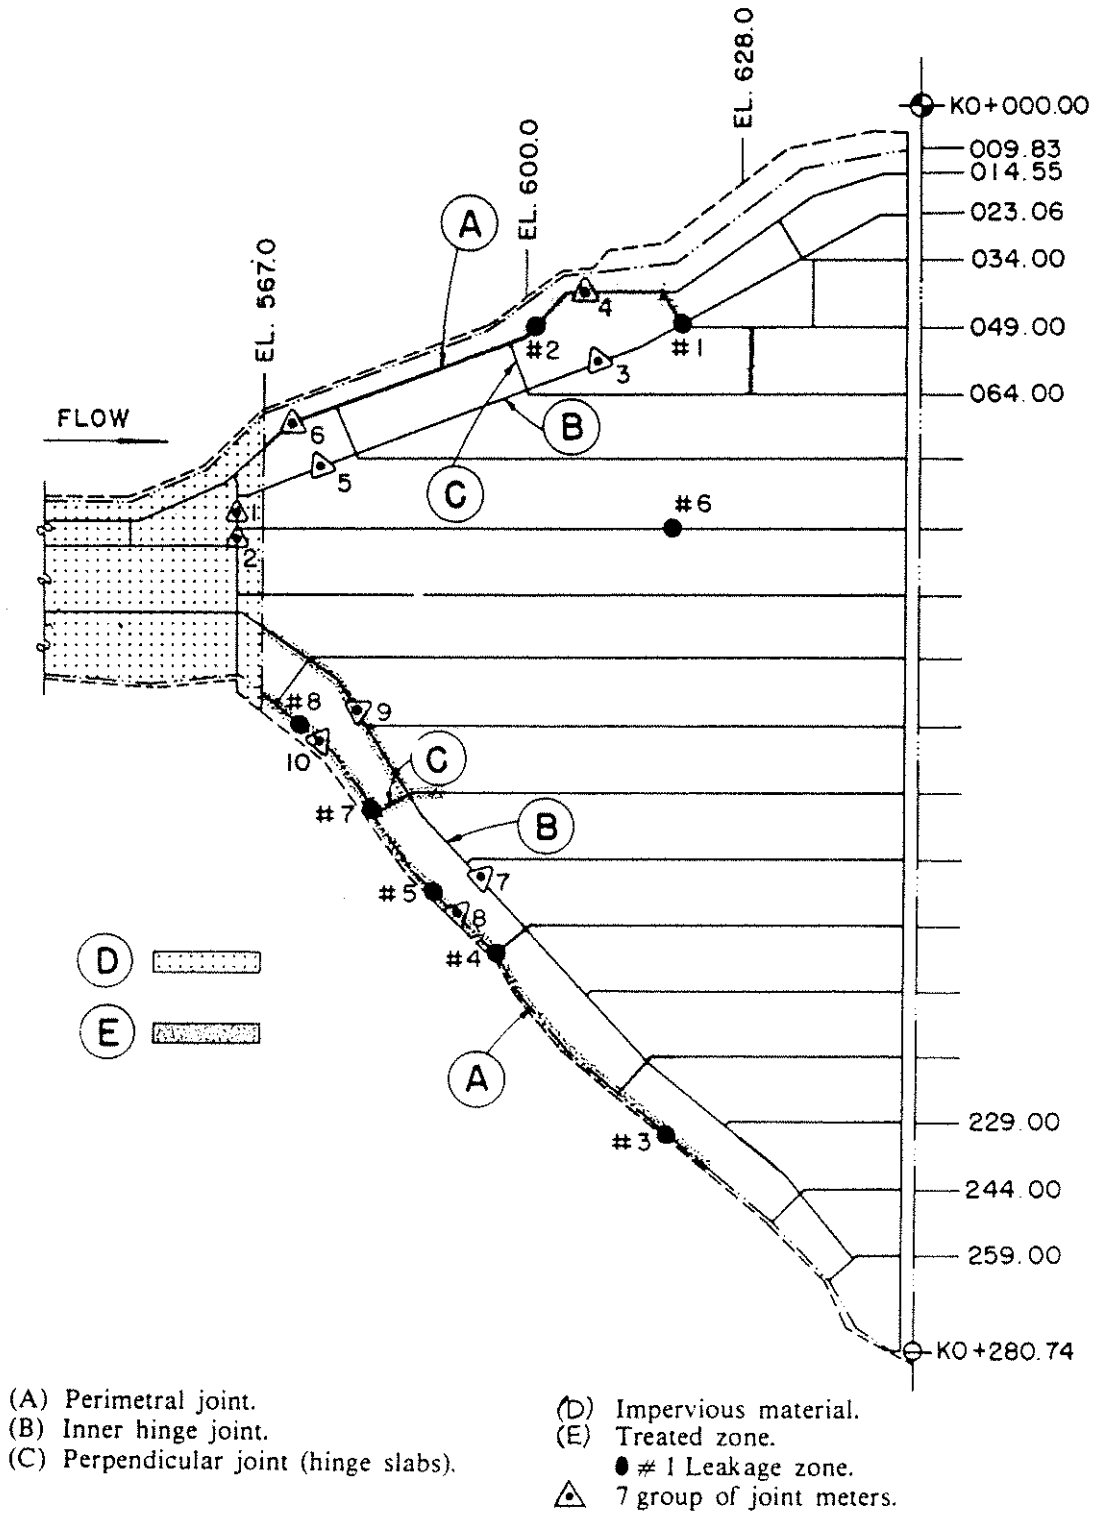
Alto Anchicaya, Leakage zones – joint meter locations.
